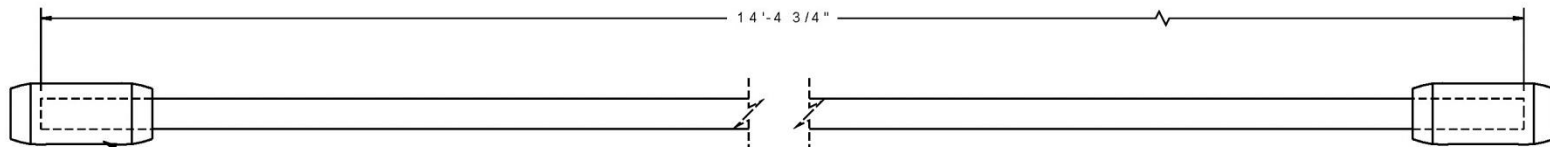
Secondary Side Cable Anchorage Details, MwRSF Short Radius Design [14]
